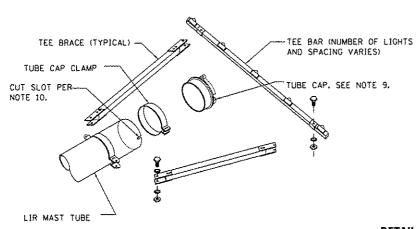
ELEVATION MG-20 LIR STRUCTURE
